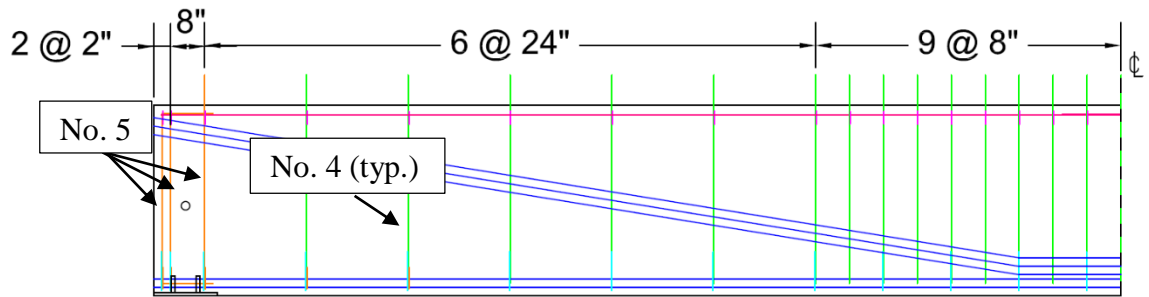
Transverse reinforcement layout for the 45M_24W girder end.
